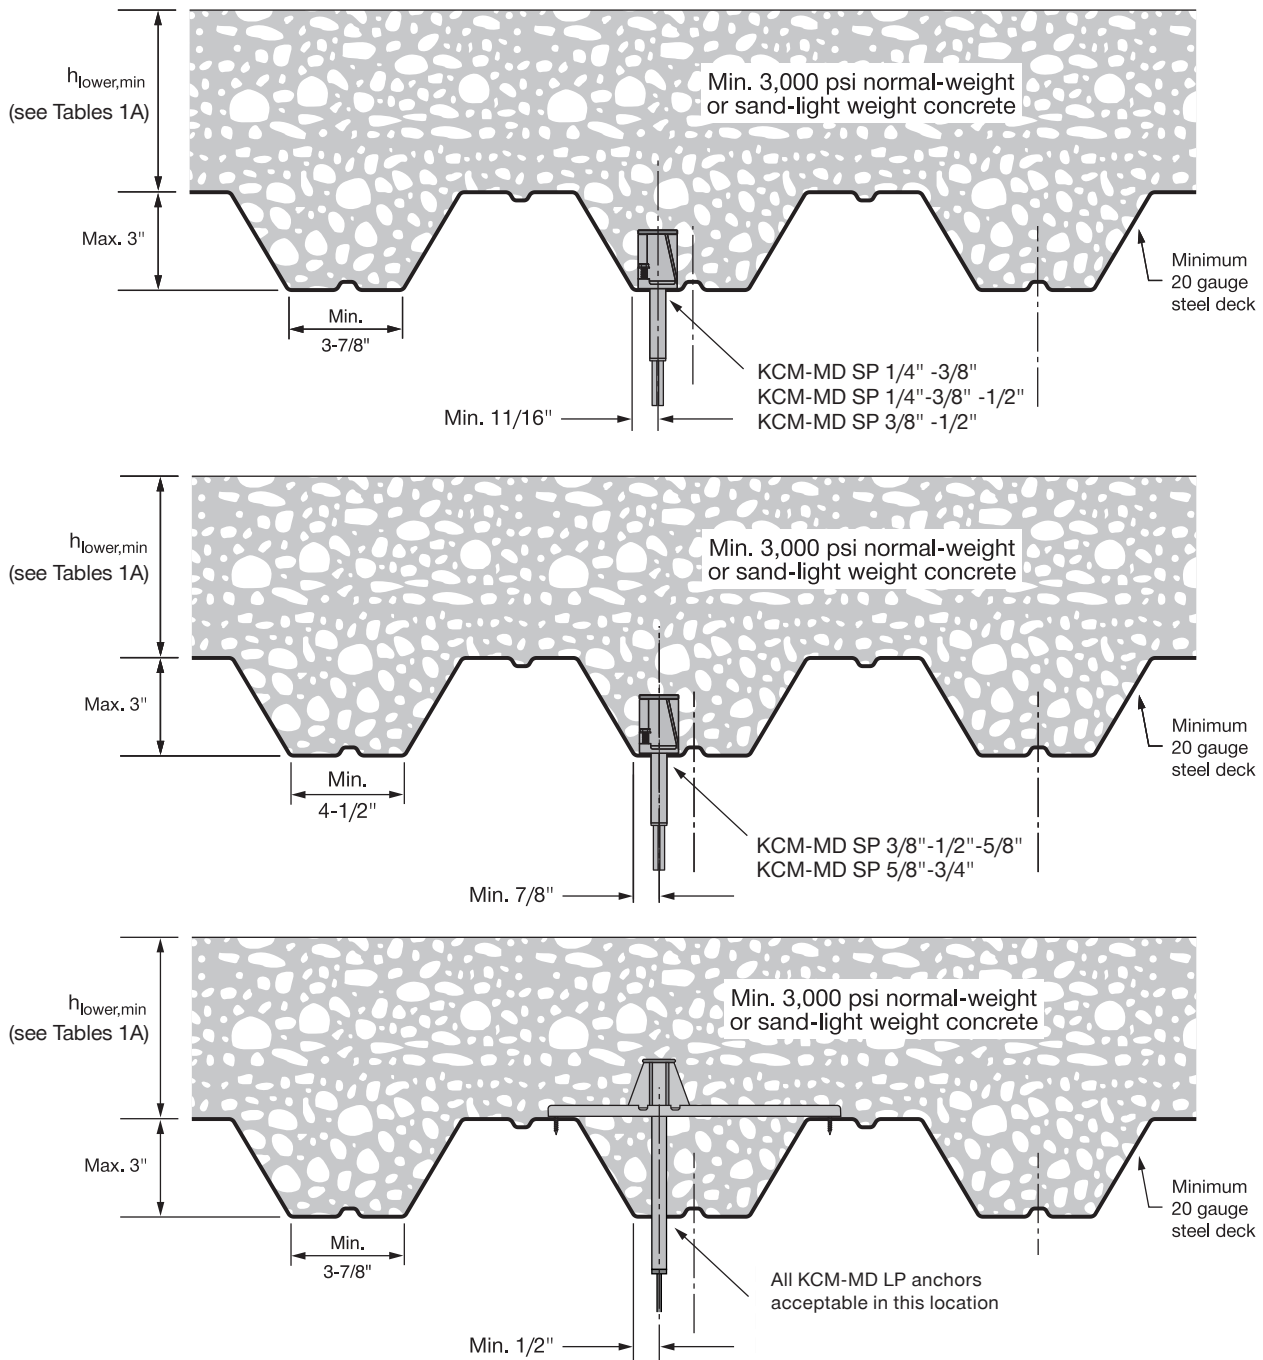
B —Installation in the soffit of concrete filled metal deck floor and roof assemblies-over lower flute (W-deck)
